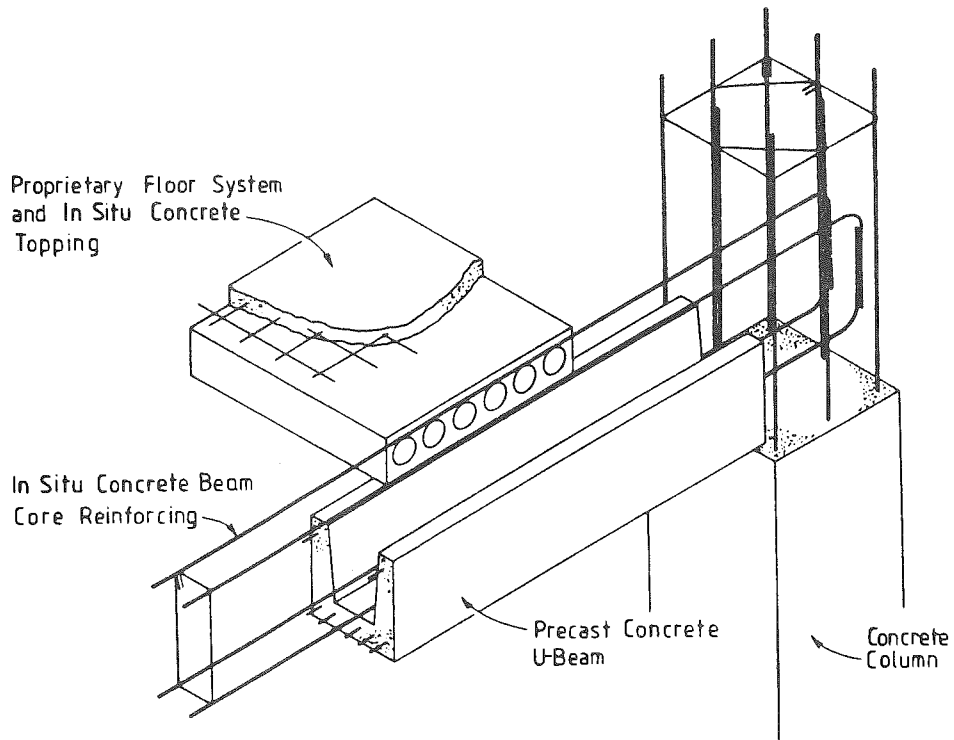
Construction Details of a Composite Structural System (not all reinforcement shown).
